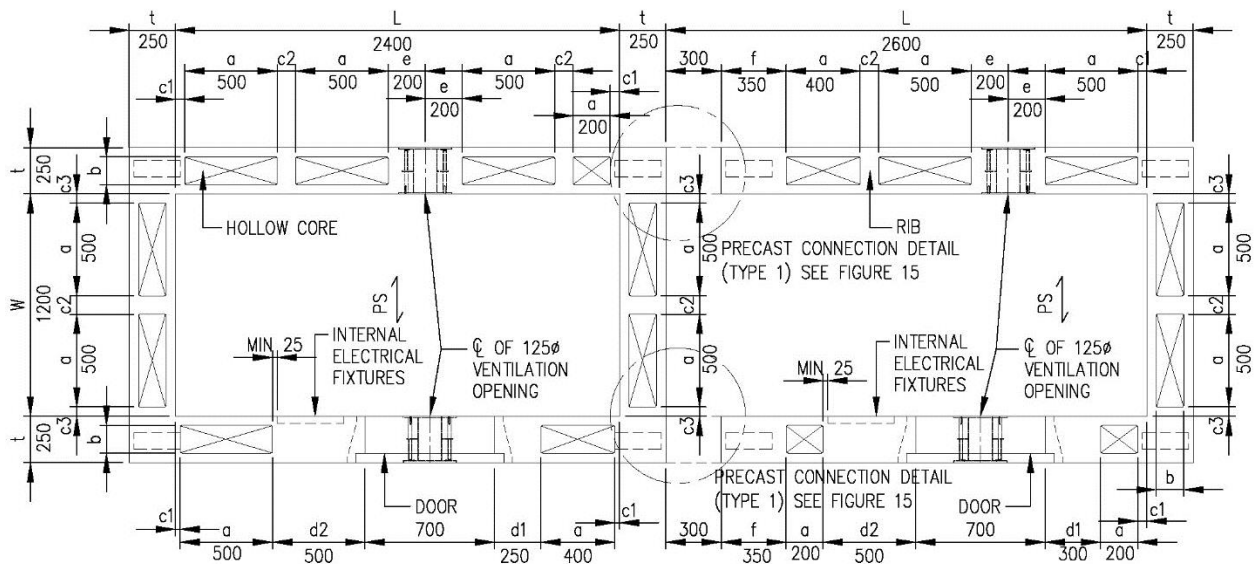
(ii). PRECAST HS AND C-SHAPED PRECAST HS CONNECTED AT THE SHORTER WALL AND WITH HS DOOR ON LONGER WALL (TYPE 4)
